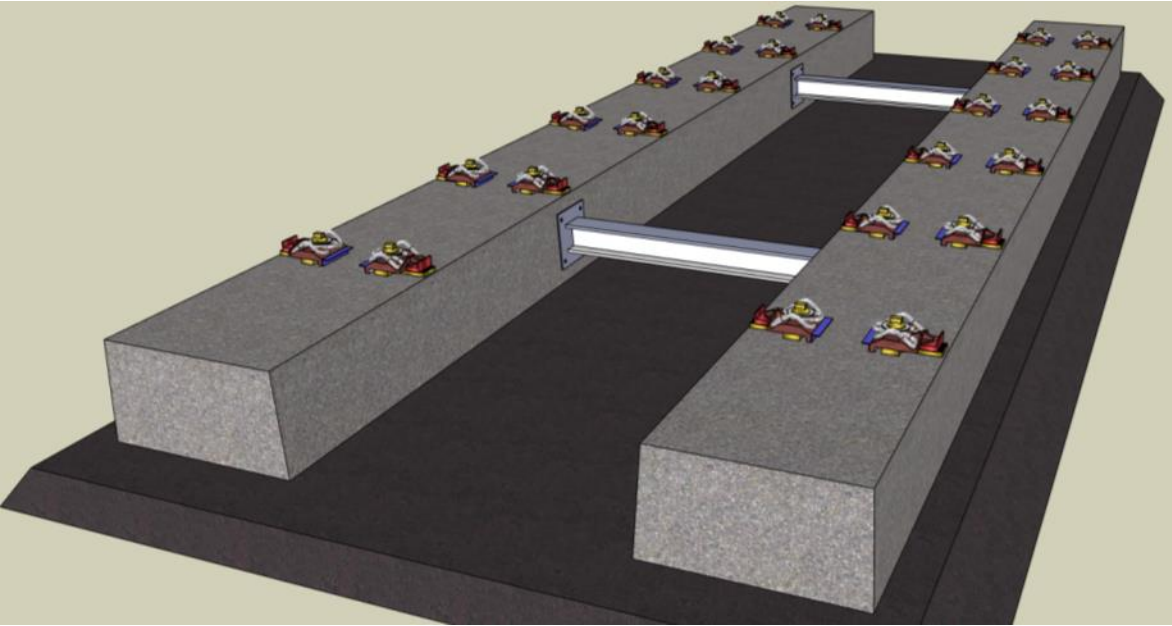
PRE-POSITIONING OF TRANSVERSAL BEAMS
